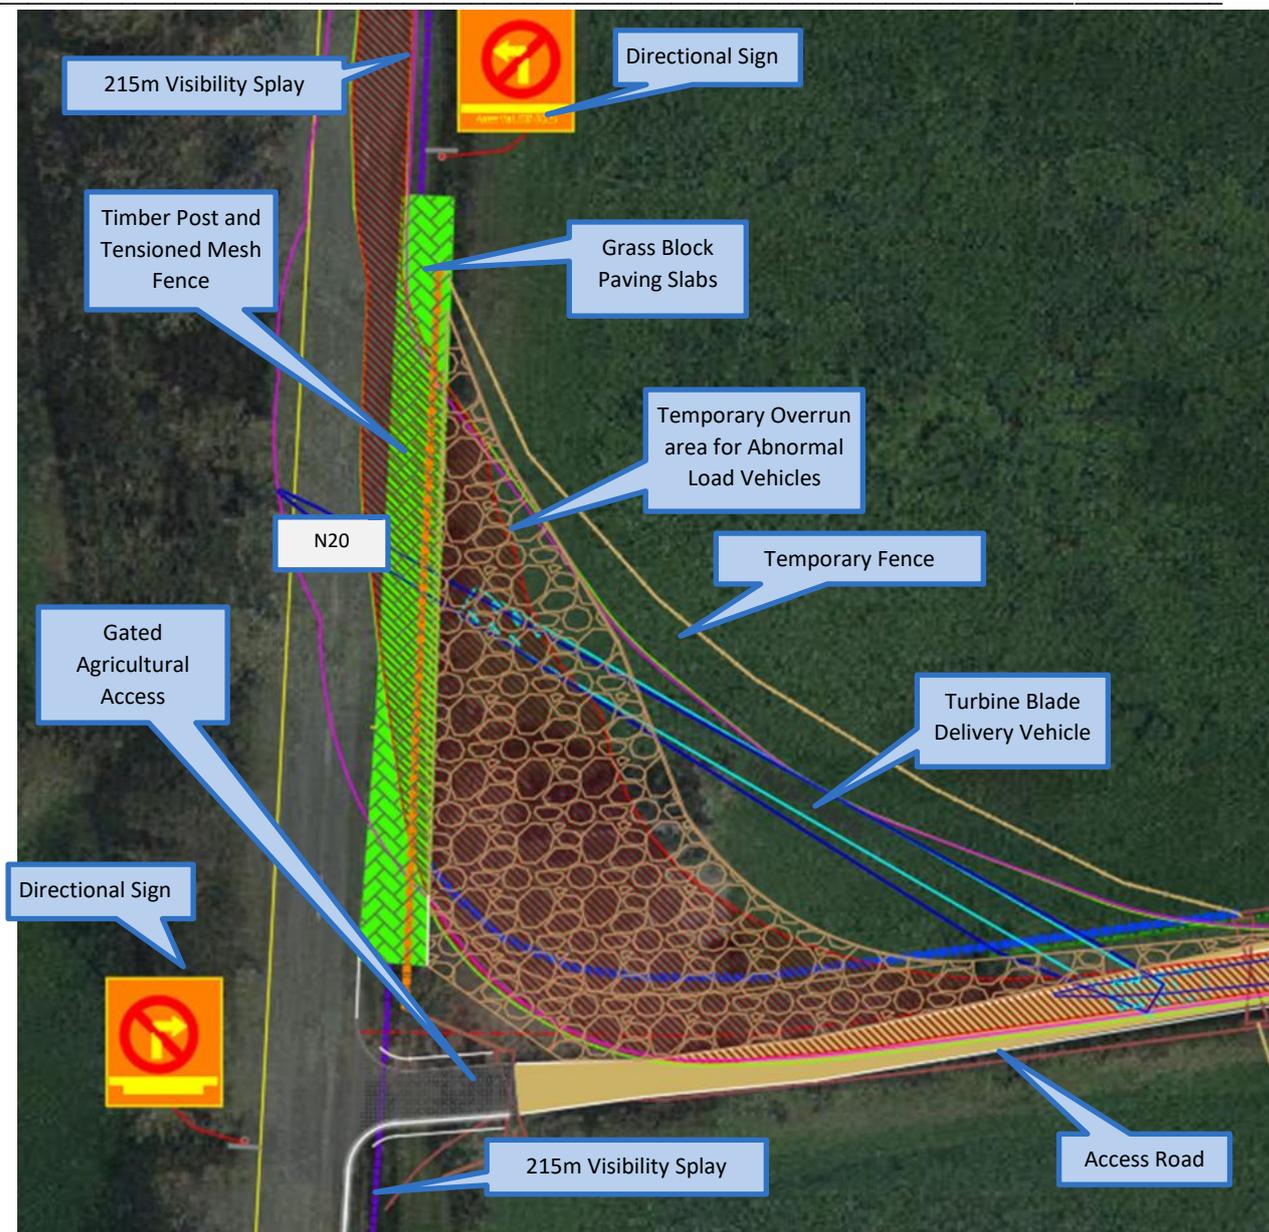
Temporary Site Entrance 1 on the N20 – Construction Phase
